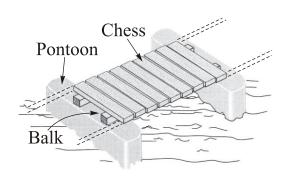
A pontoon bridge consisting of two longitudinal wood beams (balks) that span between adjacent pontoons and support the transverse floor beams (cheeses)
